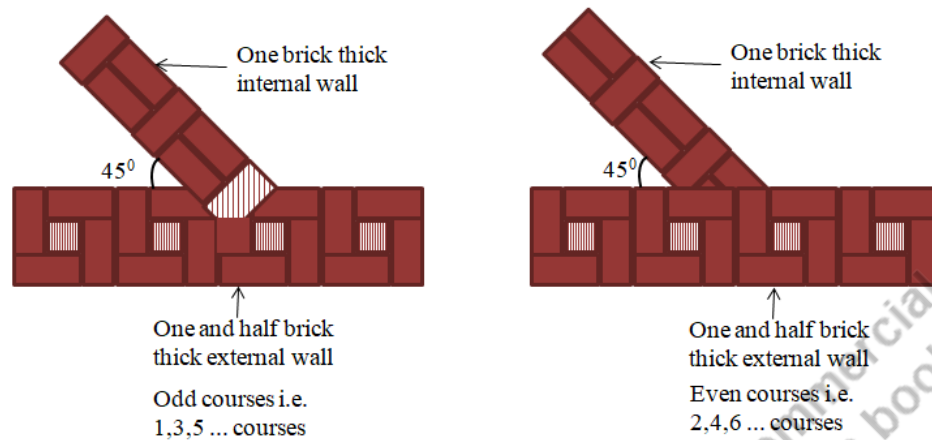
(a) Squint junction between one brick thick wall and one and a half brick thick wall
